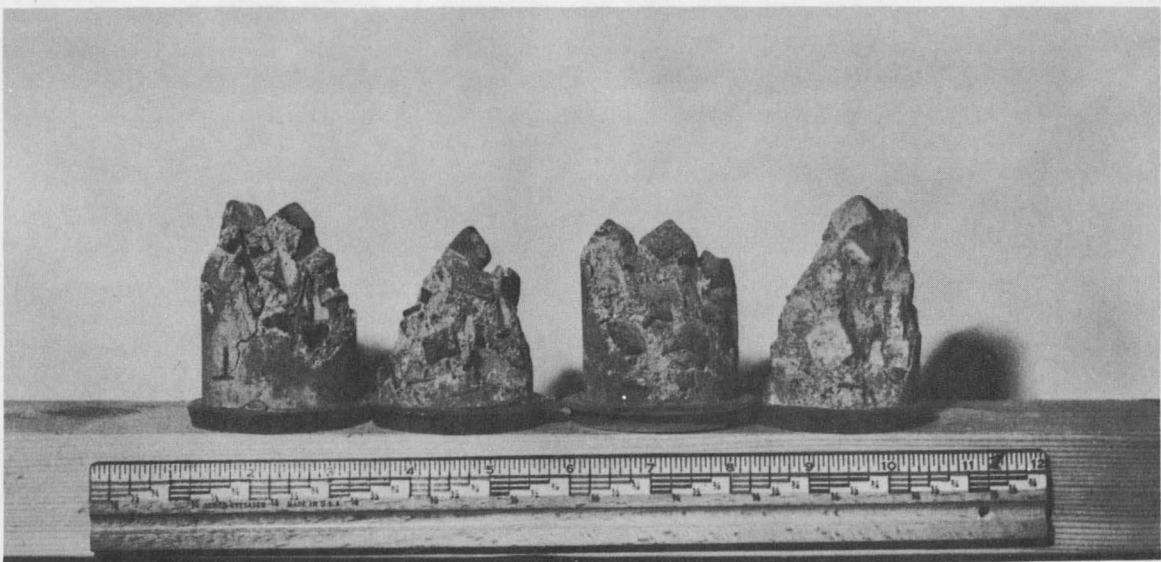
Corners and edges of protruding "key" aggregate apparently initiated failure in these cylinders.
